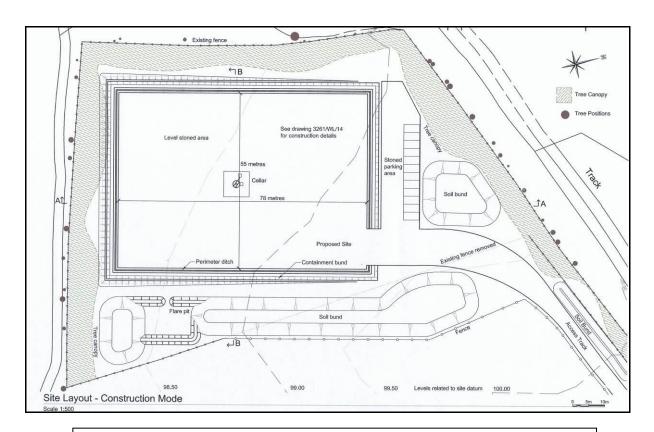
Broadford Bridge: Proposed site layout: construction mode
